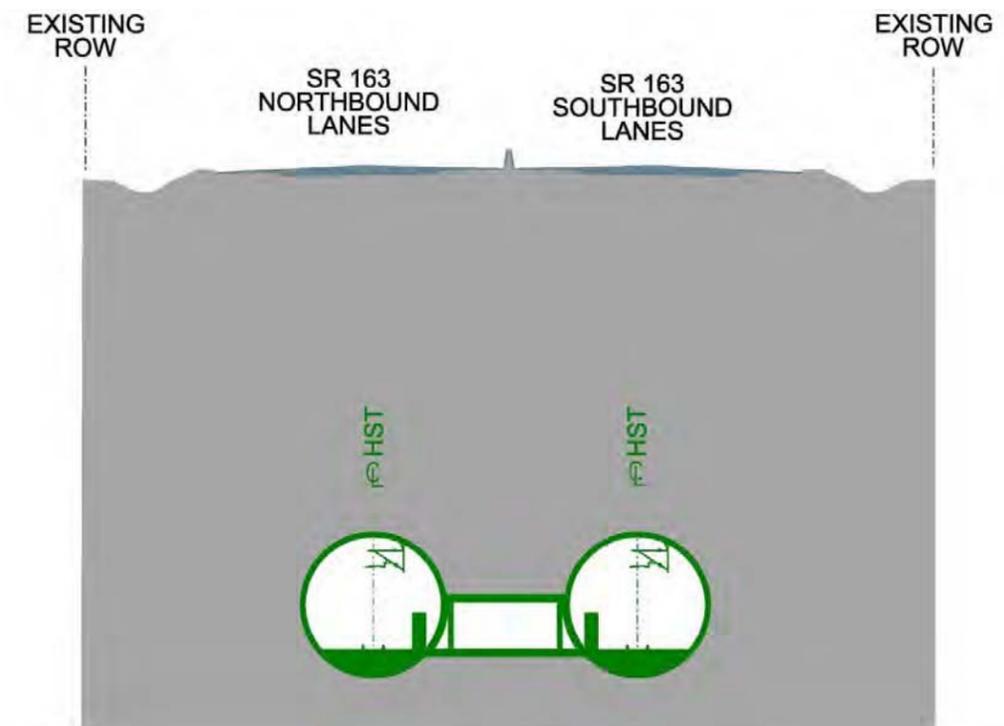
SR 163 Corridor (Looking South from Balboa Avenue)
